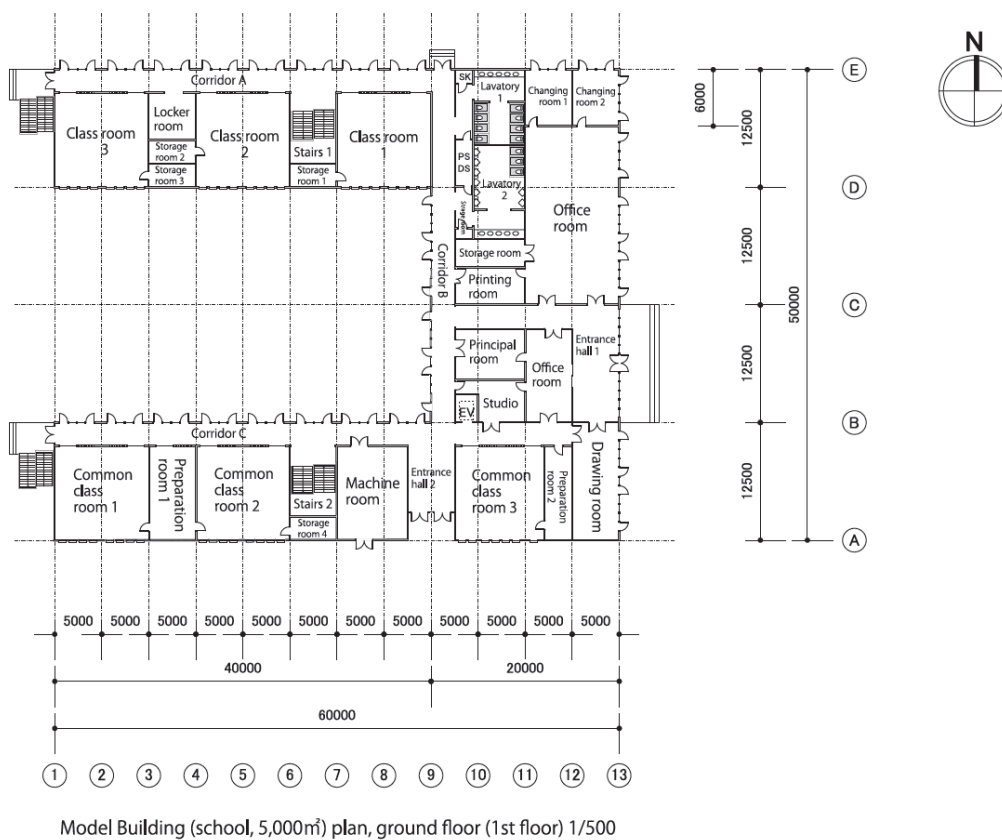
Model building (school, 5 000 m²) plan, ground floor (first floor) 1/500
